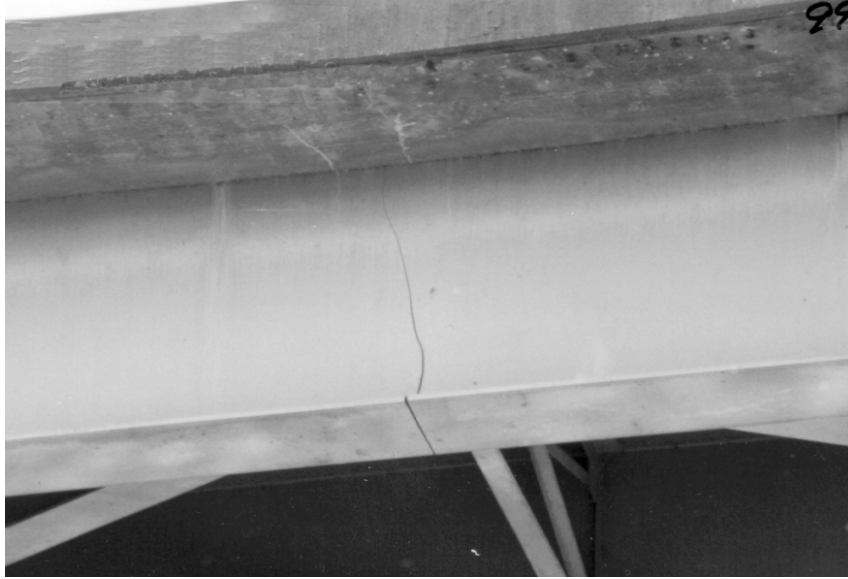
View of brittle fracture in the outside plate girder
